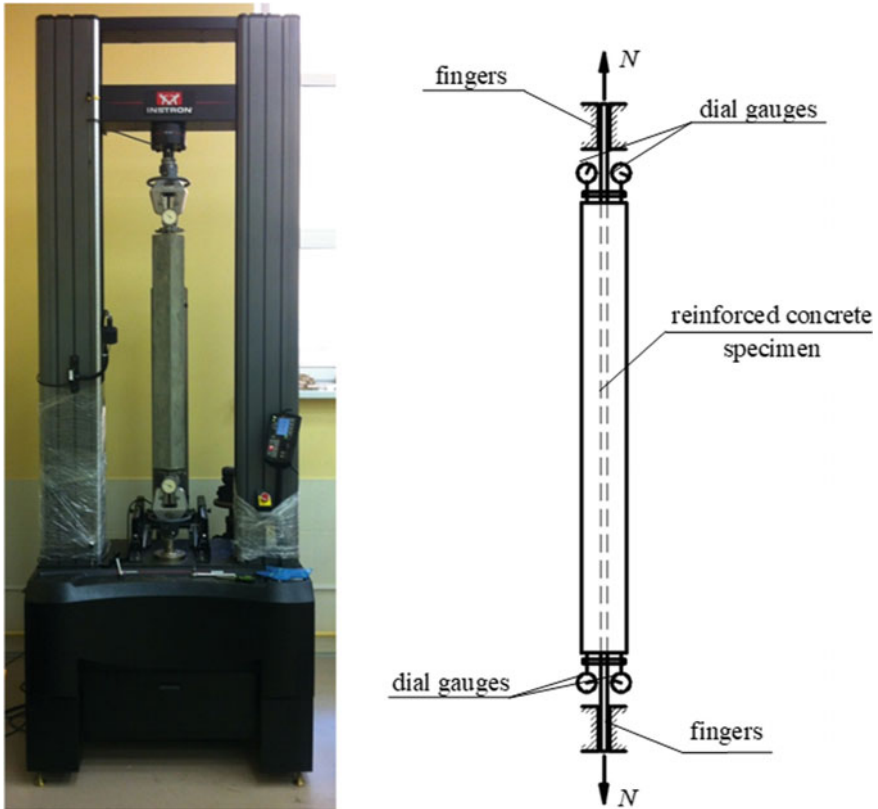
Test system INSTRON 5982 with specimen and test scheme of the reinforced concrete specimen
